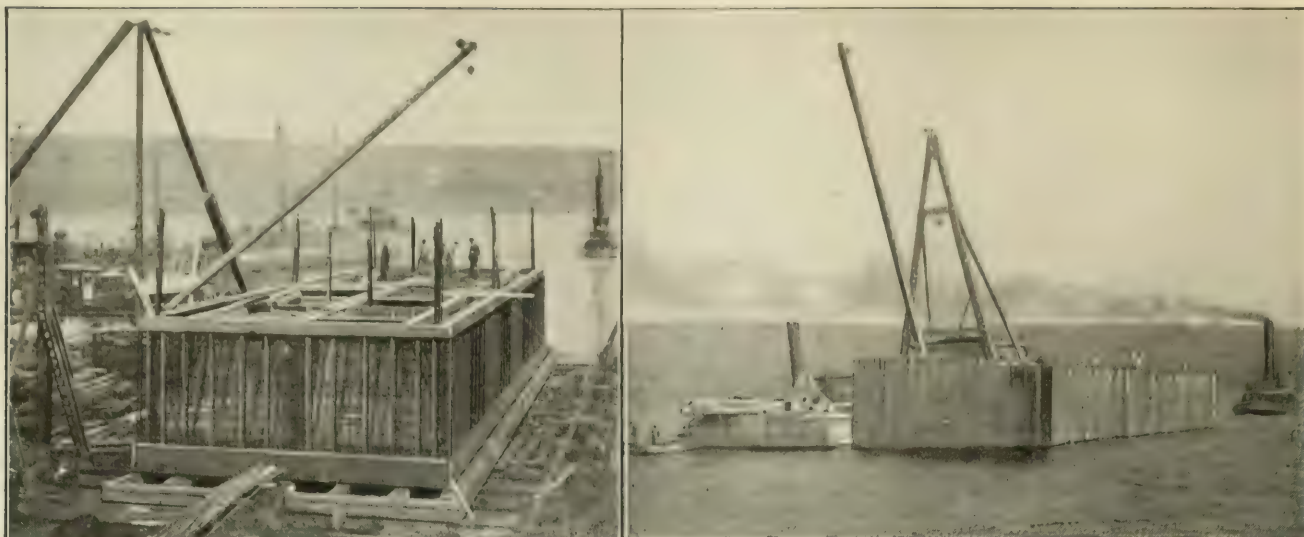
DEEP OPEN-DREDGING PIER (PIER 2) OF NEW THAMES RIVER BRIDGE
